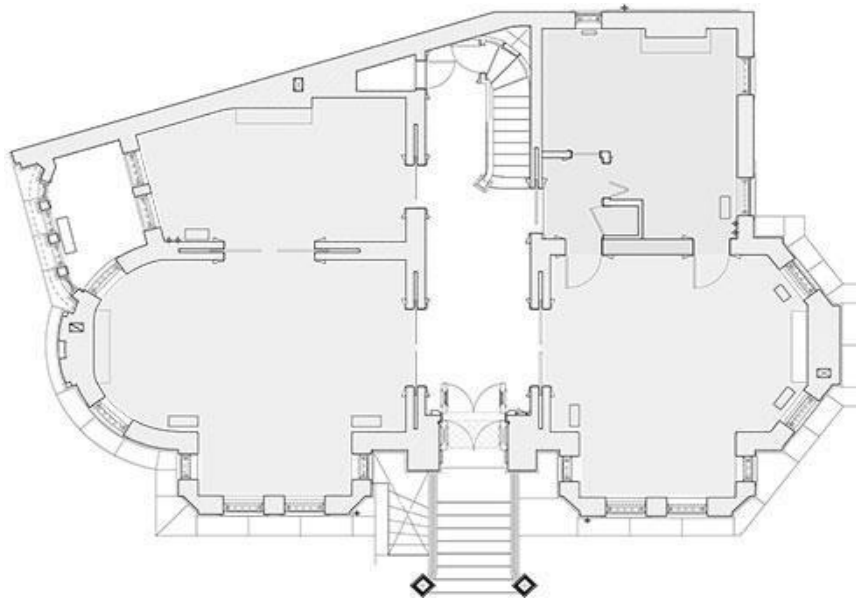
Old Korean Legation Building. First Floor. Looking west.
